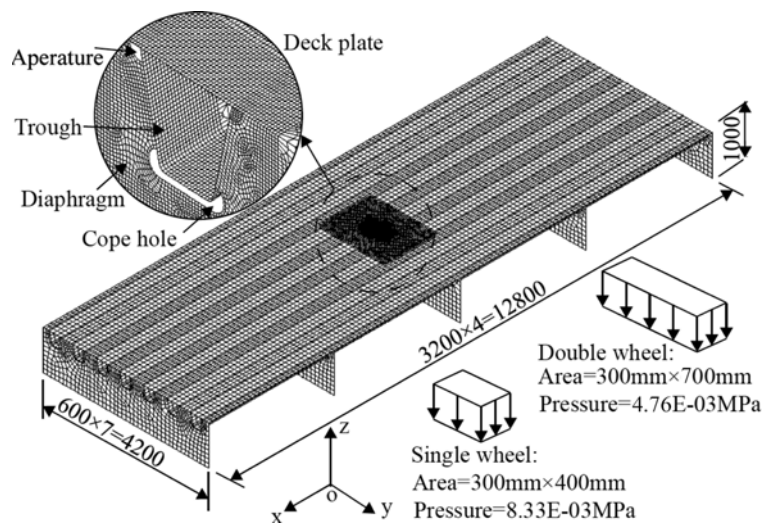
Finite element model of a steel bridge deck (Unit: mm).
